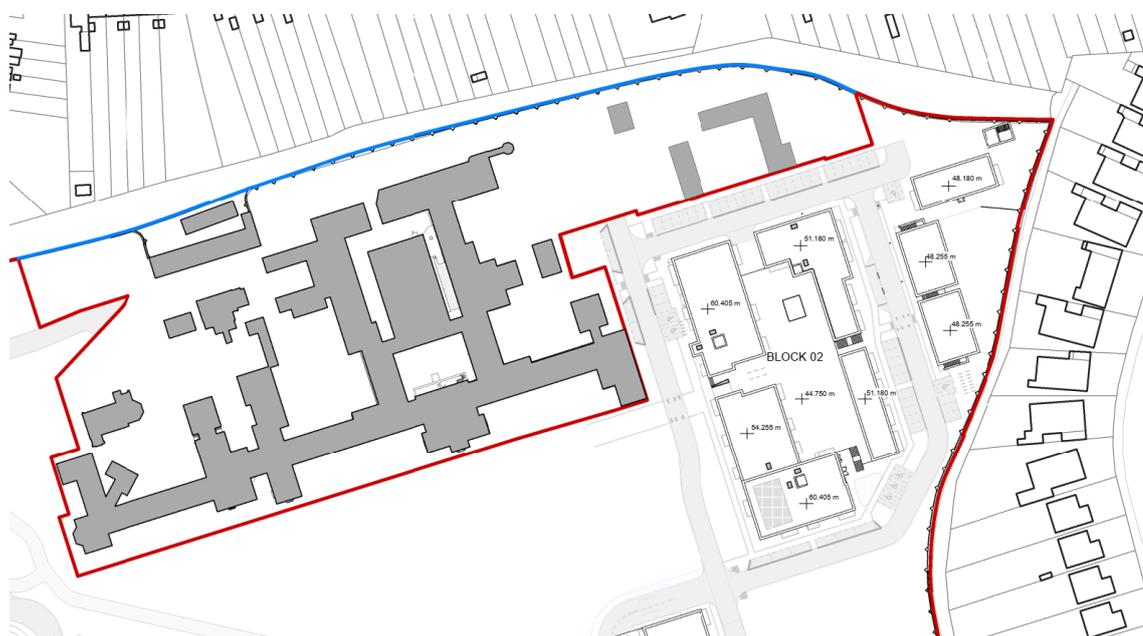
Apartment Block Construction to east of Main Hospital Building
